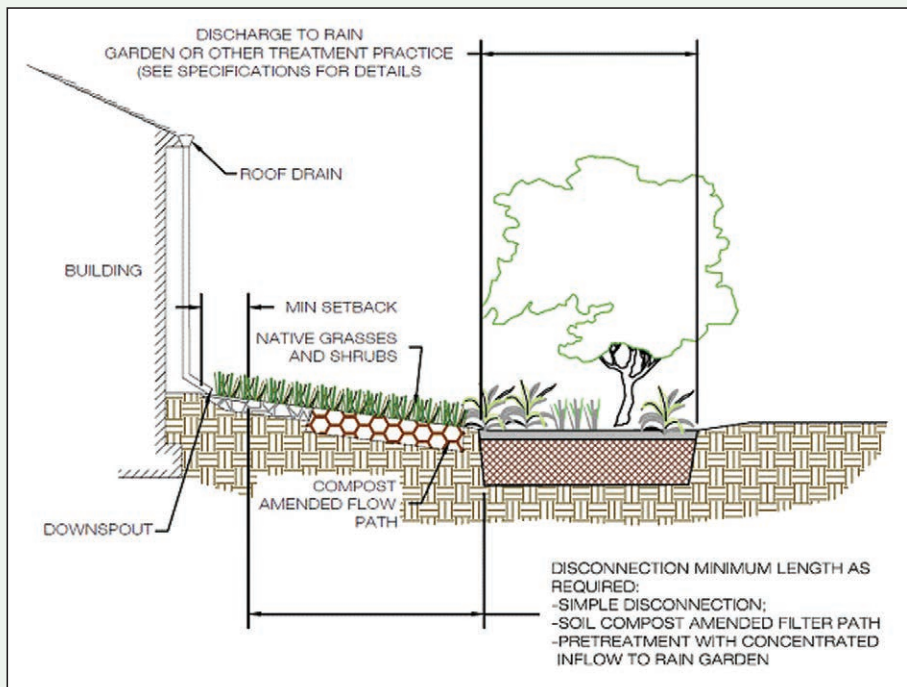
Rooftop disconnections are simple ways to remove stormwater runoff from roofs from the storm sewer system and ensure that runoff is slowed down and filtered through soil before reaching local water bodies as groundwater.
